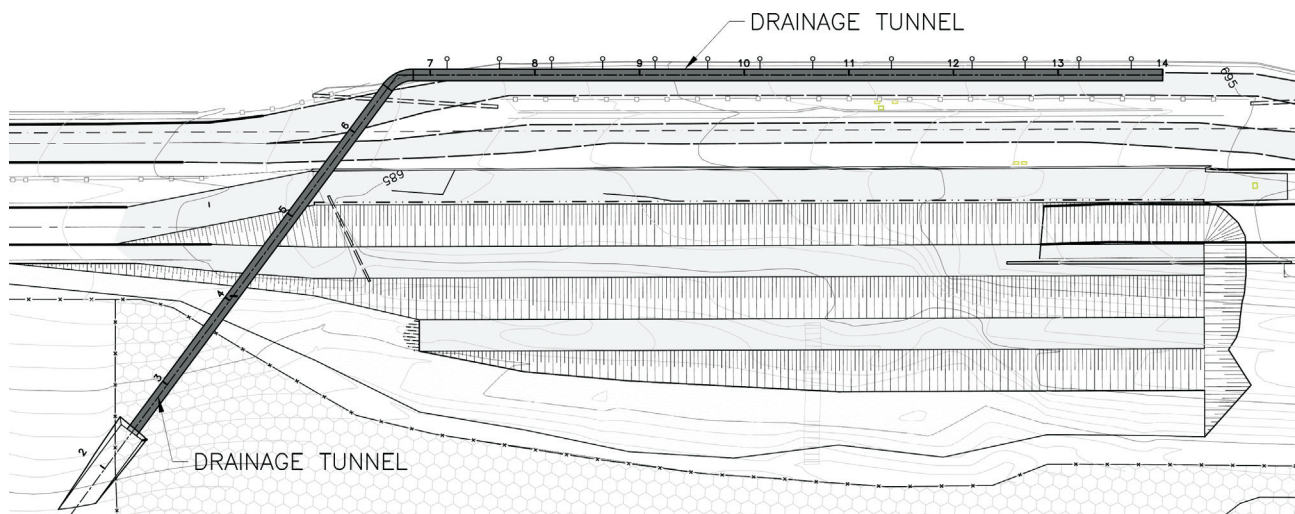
Plan view of the tunnel. The southern part of the tunnel was located in a position to allow gravitational drainage.
